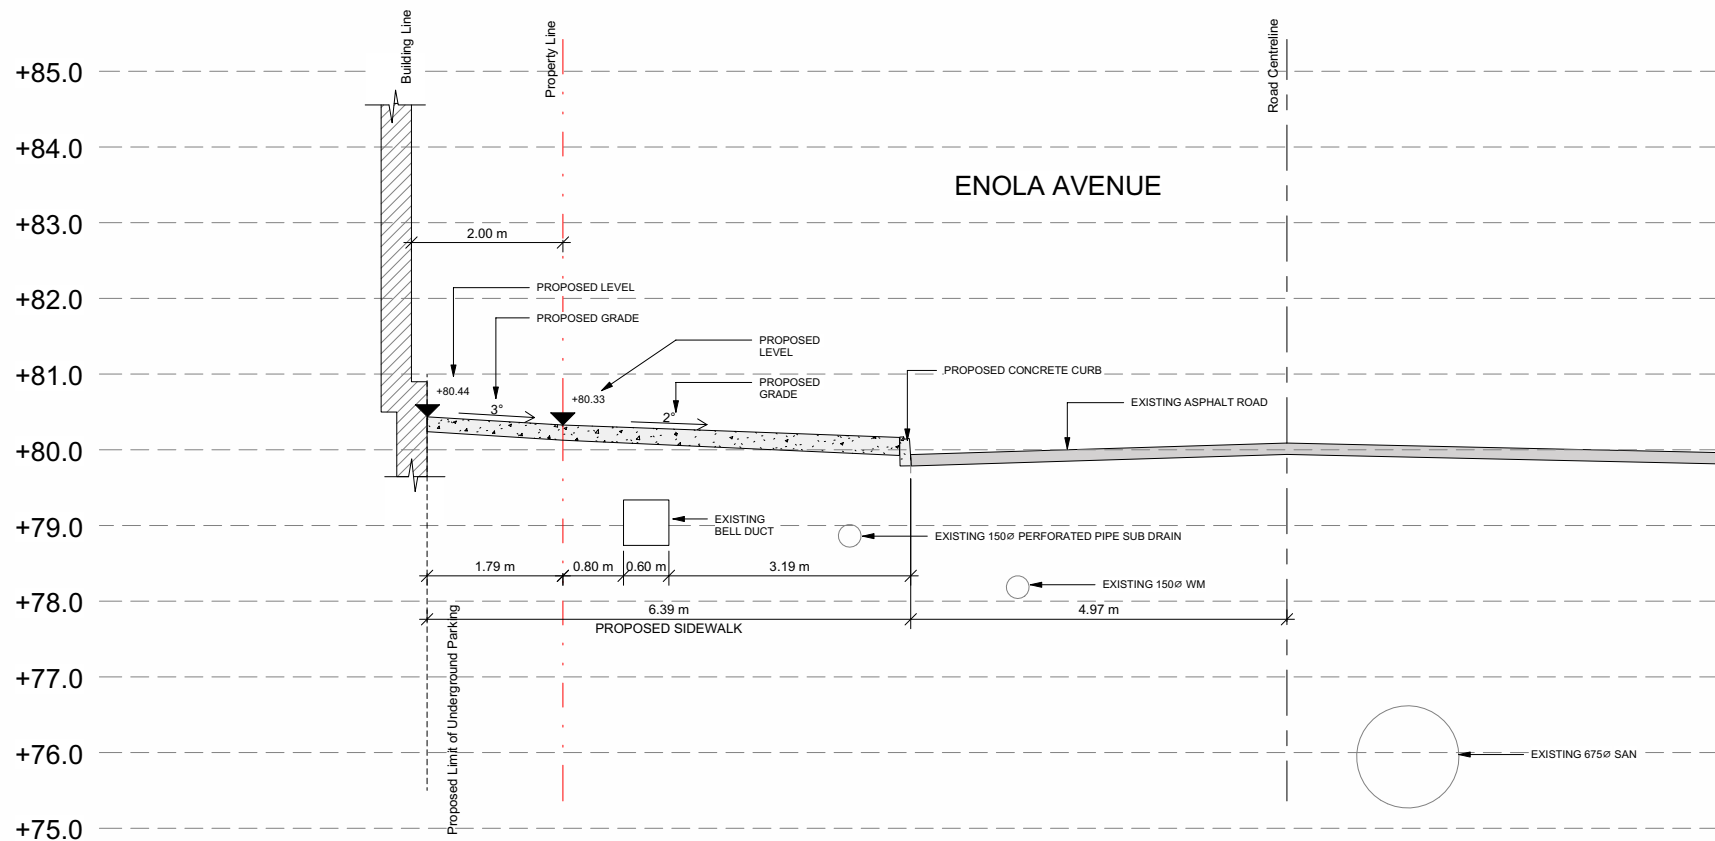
Proposed Enola Avenue street section (please see Appendix 1 for 1:50 sections)
